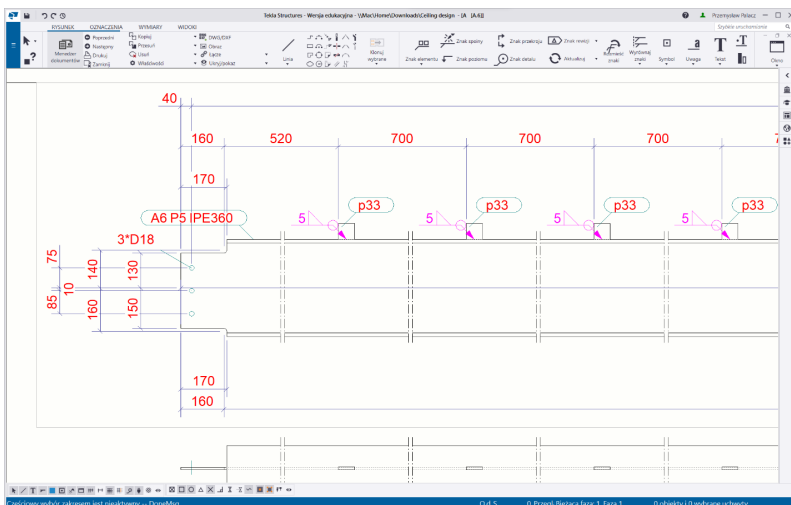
Workshop drawing of a secondary beam generated from a 3D model in Tekla Structures
